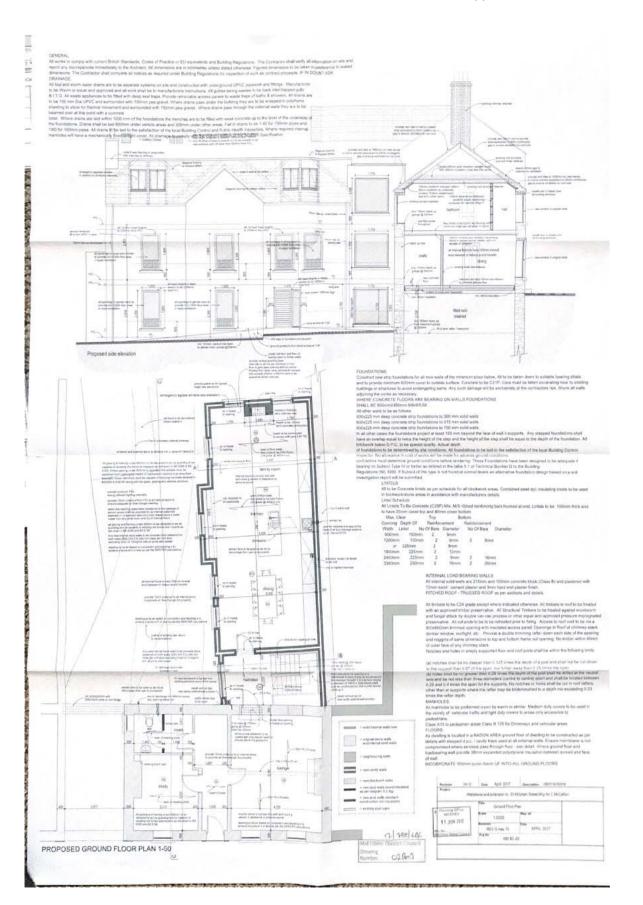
Rev3 Type: Floor Plans Status: Approved
